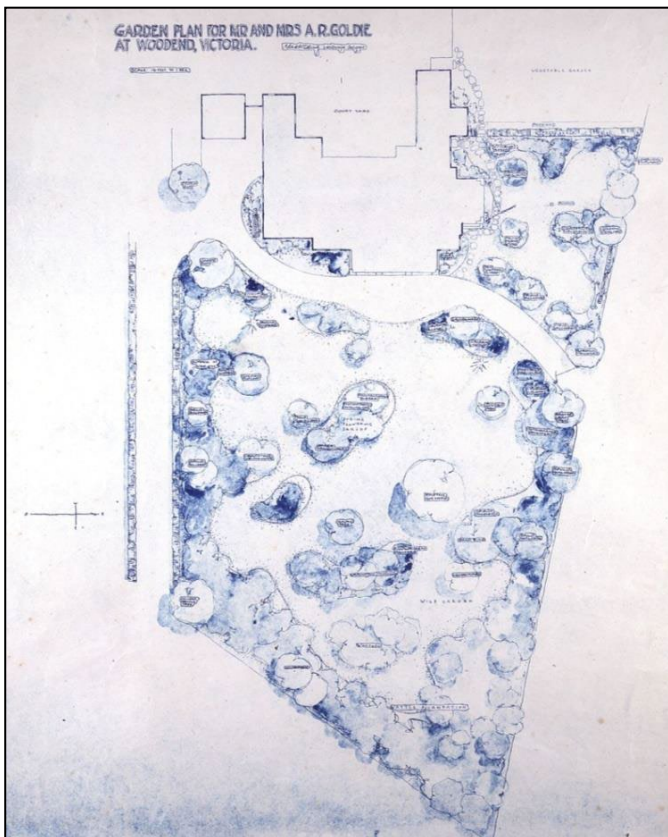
The Edna Walling design for the garden at the subject site. Although dated c1920-c1965, the design probably dates to soon after the construction of the house (Edna Walling Collection, SLV Image H97.270/79). The hedgerow bordering the southern edge of the garden, border garden bed alignments and mature plantings, and the stone pathway
